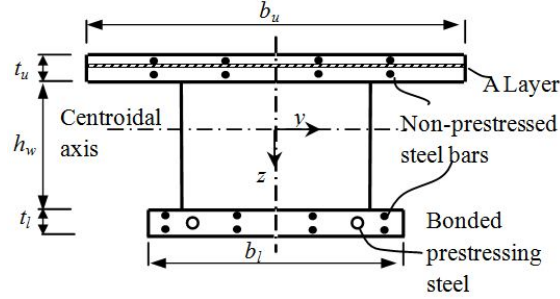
Typical cross sections and simplified arrangement of steels of a bridge
